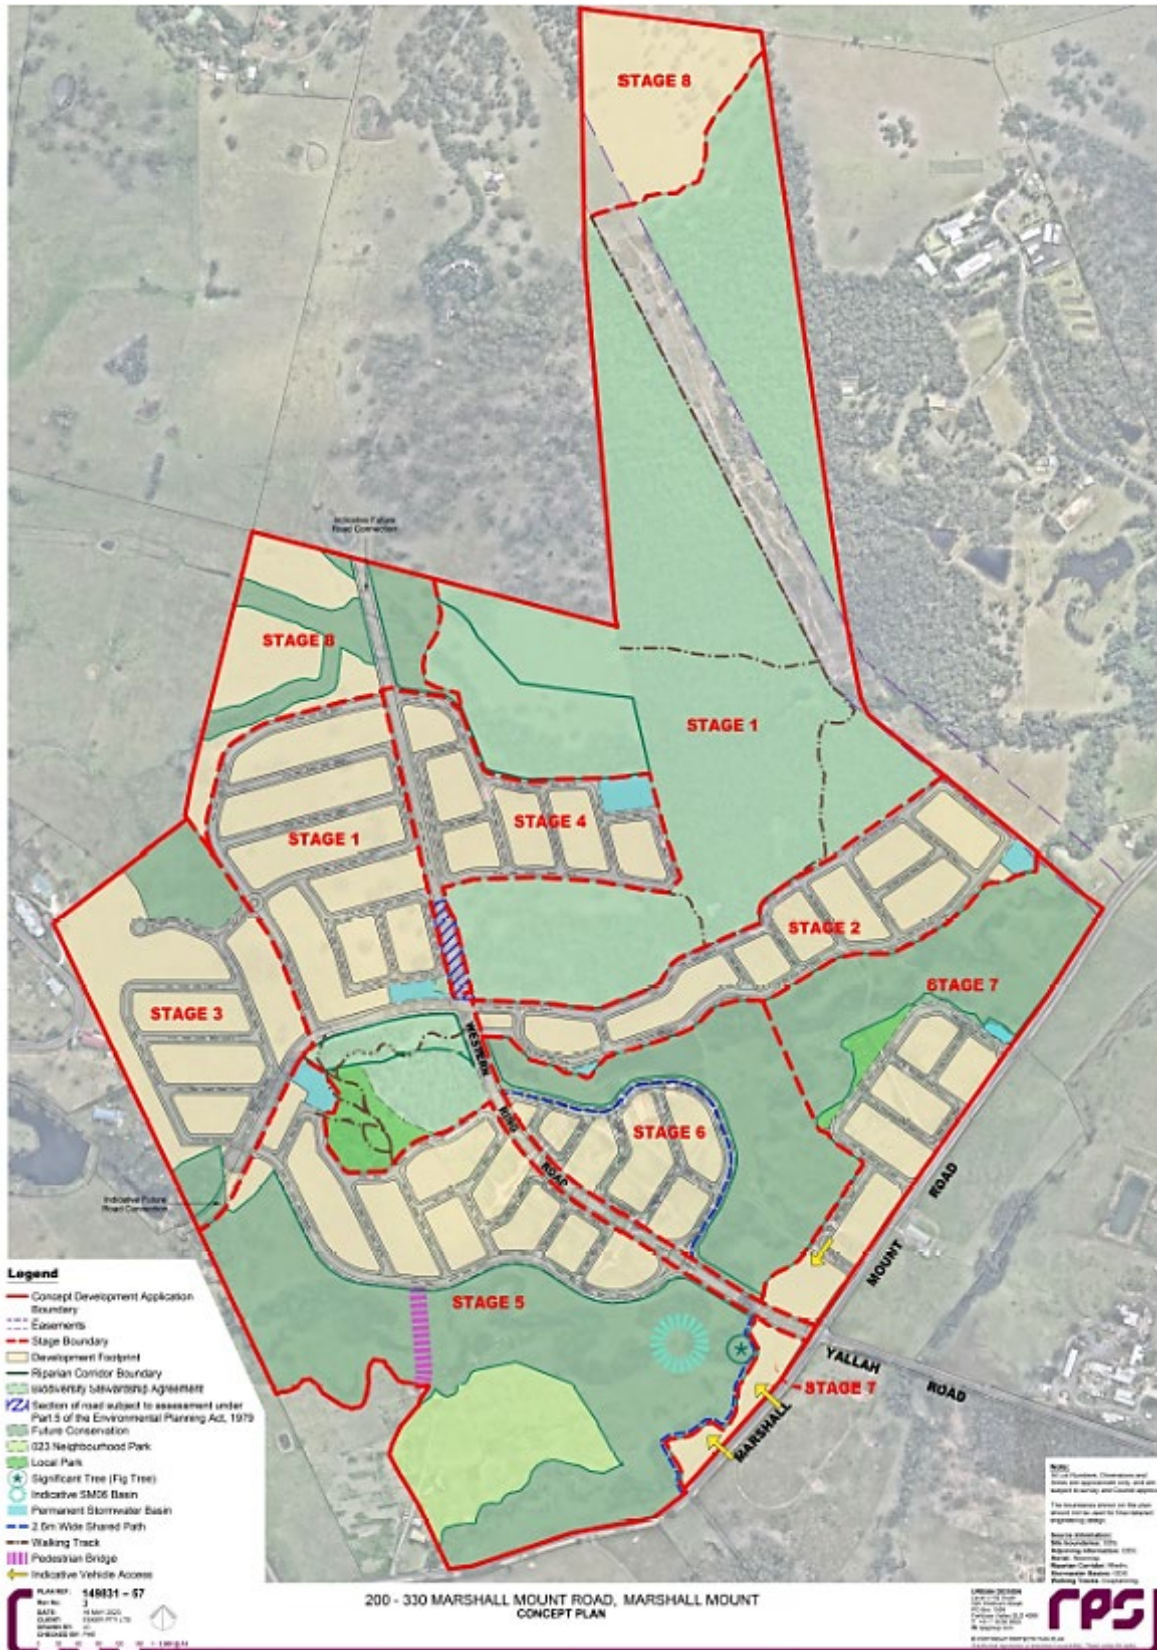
Extract from RPS Urban Design Series of plans showing additional parks
